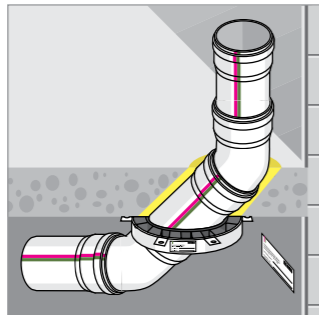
Installation of fireproofing collar (only for installation on ceiling)
